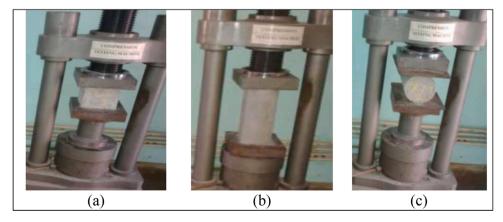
View of specimens testing (a) compression on cube, (b) compression on cylinder, and (c) split tensile on cylinder.
